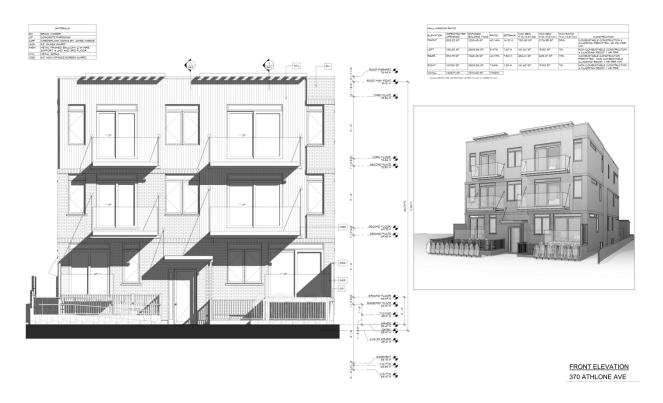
Front Elevation of Proposed Building (Source: Grant Henley Design Group)
